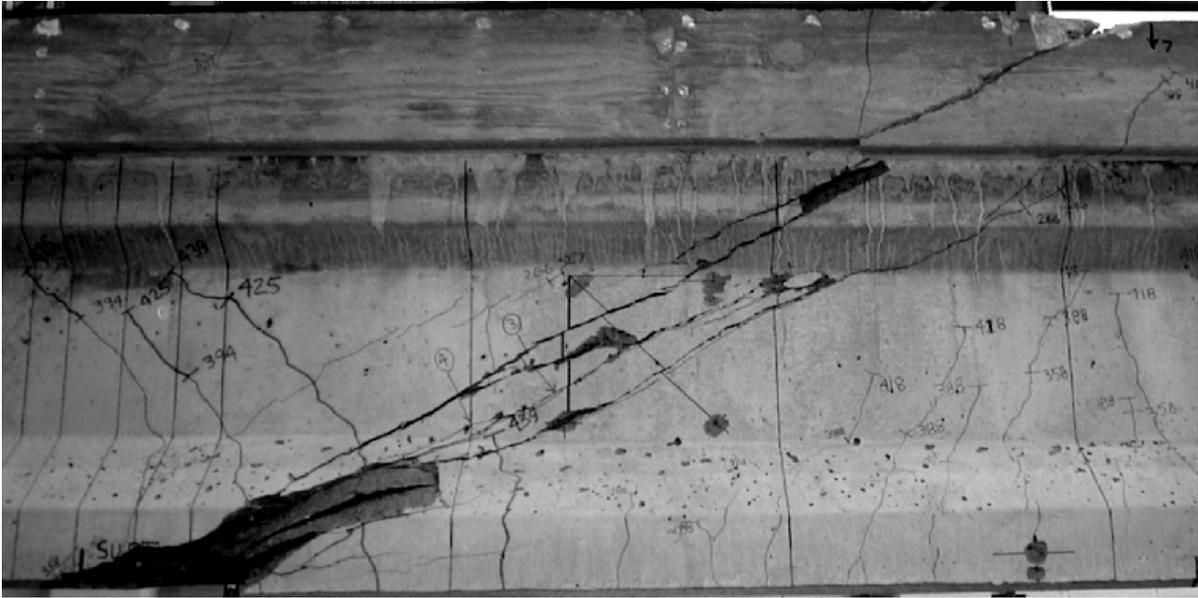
Girder G2A-Center Section Test Crack Patterns
